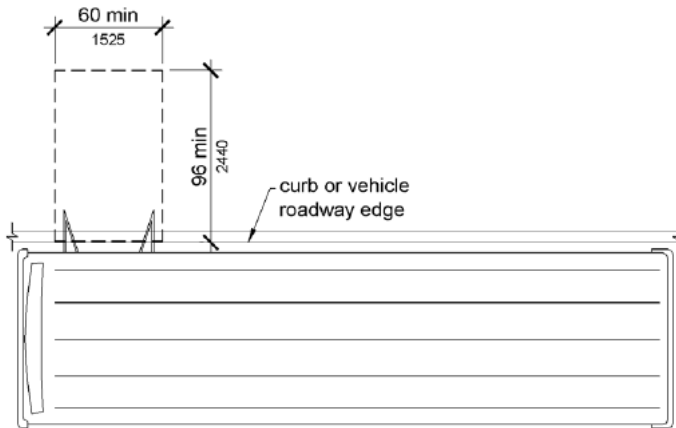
Dimensions of Bus Boarding and Alighting Areas
